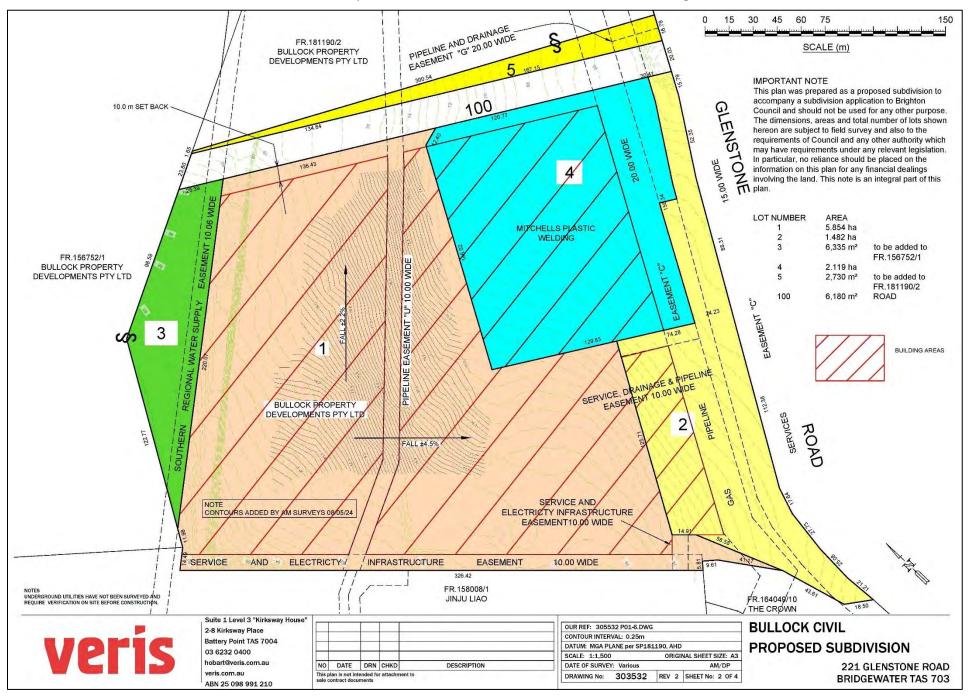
Plan of proposed subdivision and minor boundary adjustments (Veris Surveying, September 2024)
